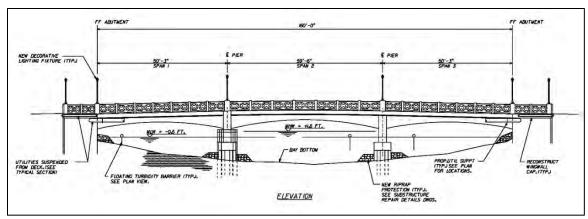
Venetian Causeway Bridge 4 (8DA14376), Elevation View
